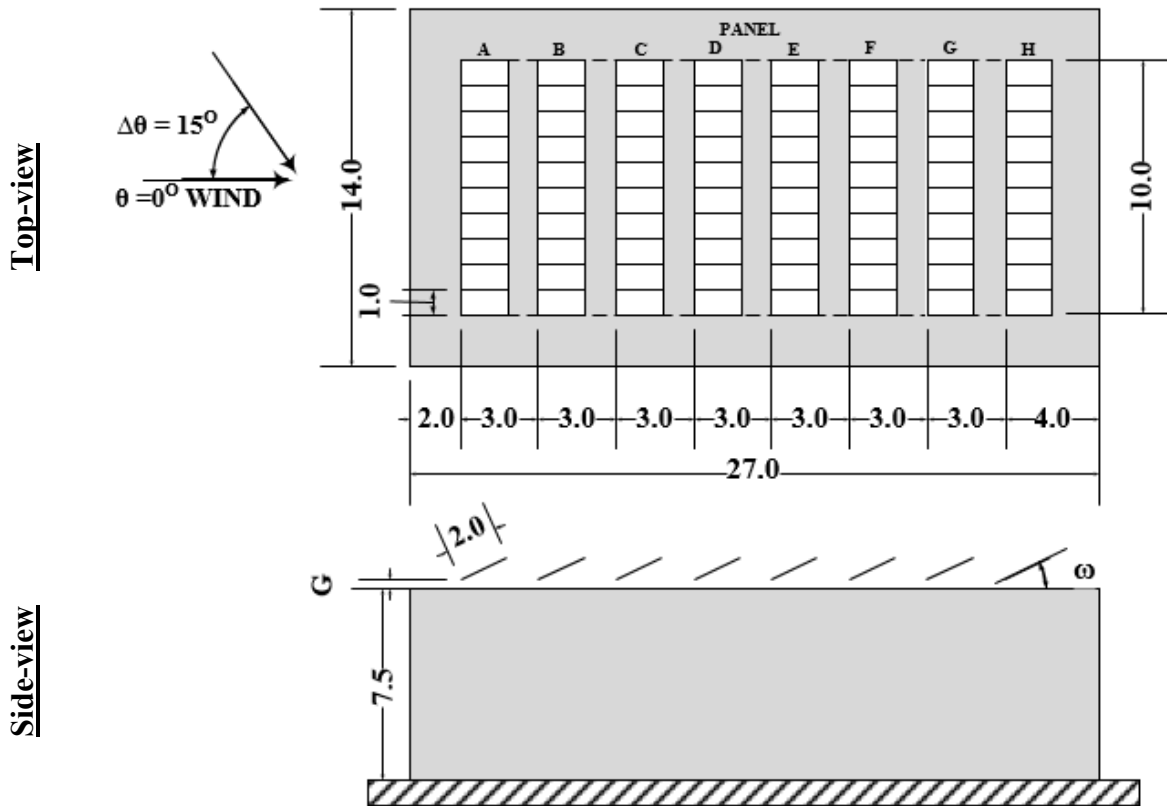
Schematic illustration of the full-scale equivalent installation (dimensions in m)
